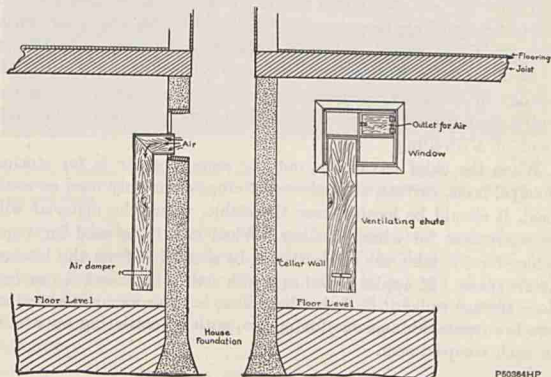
Details of construction for the ventilation of a storage room in a basement. The air duct may be made of wood, terra cotta, or metal and installed in place of a pane of glass, thus avoiding cutting through the cellar wall. A hinged door the size of another pane of glass may serve as an outlet for the warm air.
